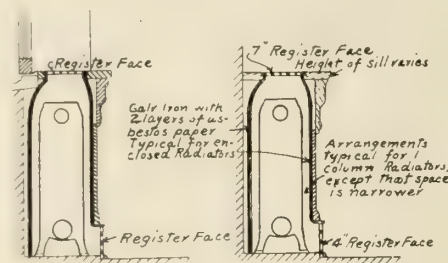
Typical section through enclosed radiators where same set under windows on 4th and 18th floors.
